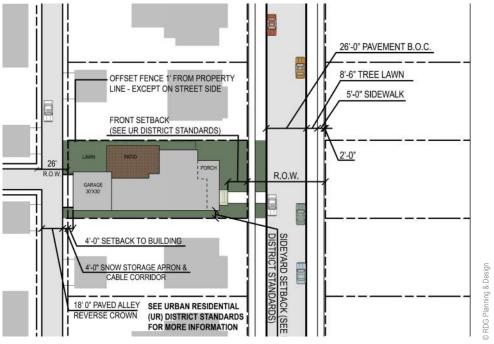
TYPICAL RESIDENTIAL LOT LAYOUT
